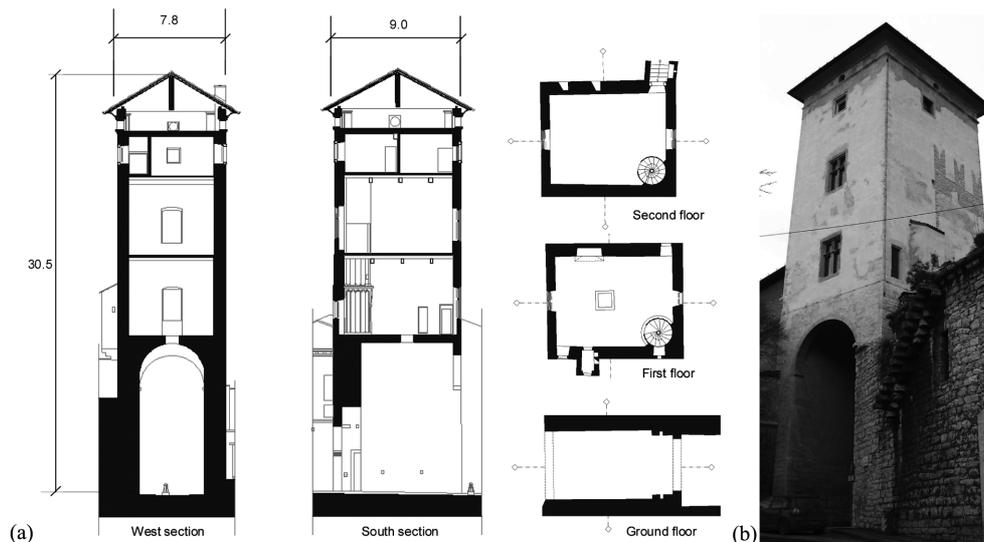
(a) Plan view and cross sections of Torre Aquila and (b) overview of the tower
